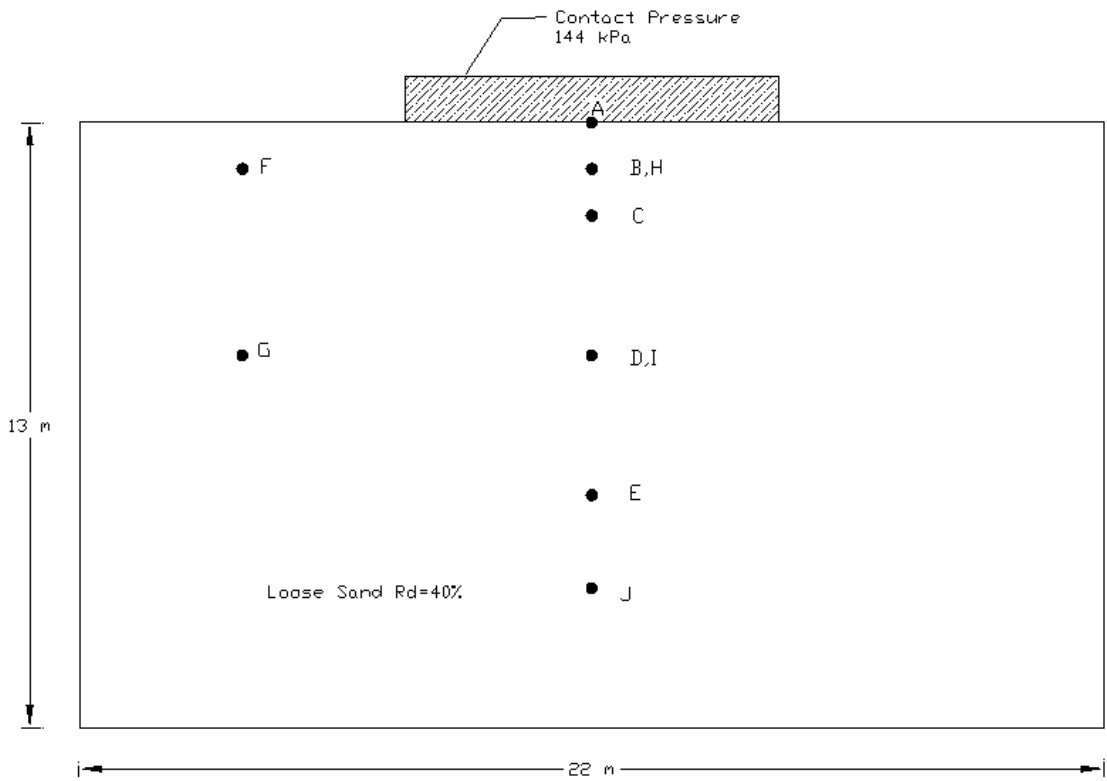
(e) Benchmark model with Footing (Cross-section)
